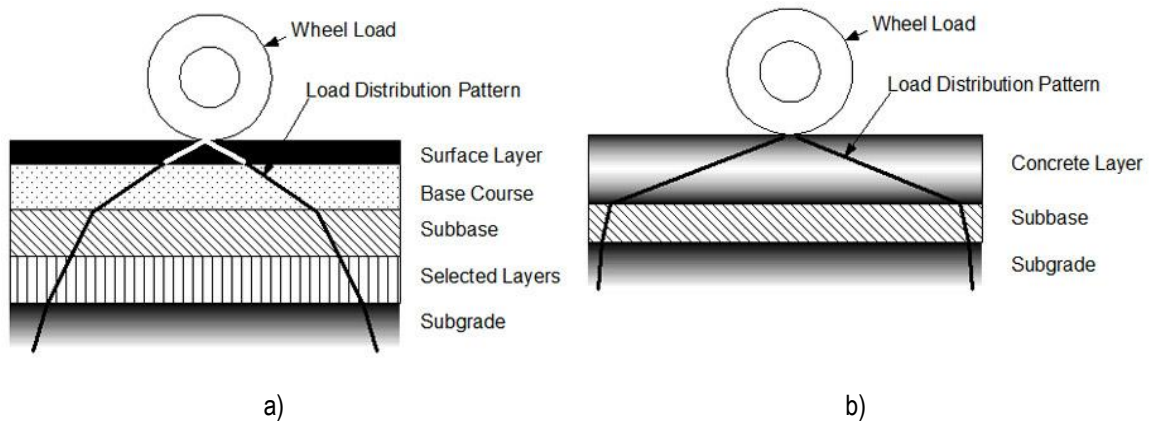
Pavement layers: a) flexible pavement ; b) rigid pavement (SANRAL, 2011)
